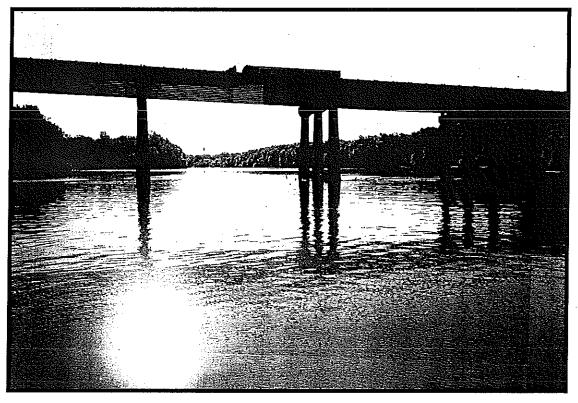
September 1997 photograph of downstream elevation of I-85 bridge over the Yadkin (courtesy of NCDOT Bridge Maintenance Division).
